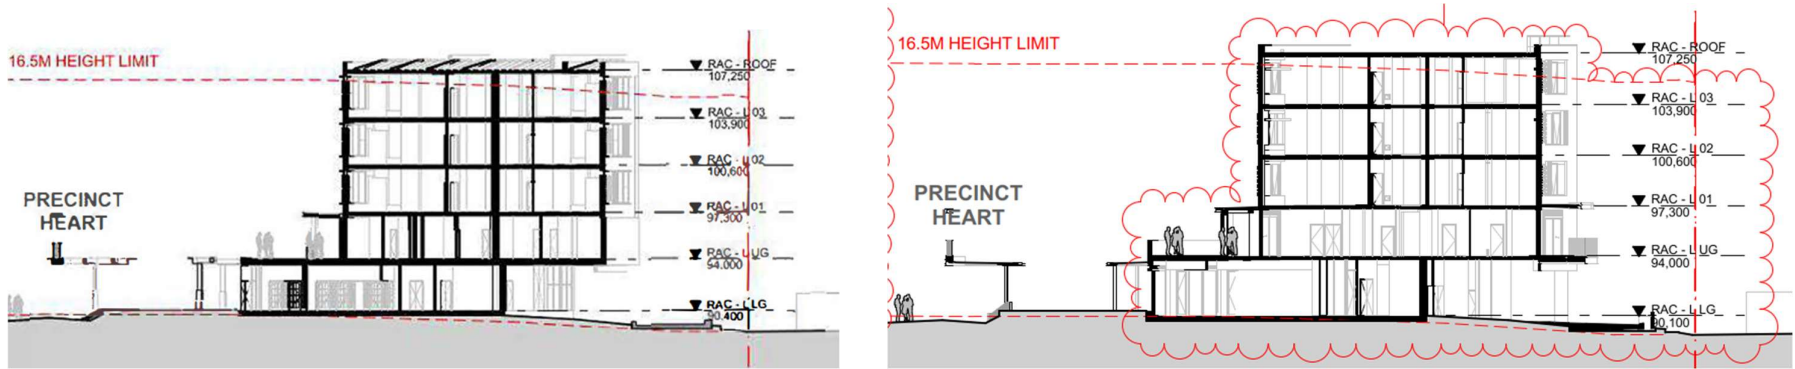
Approved and Proposed E-W Section of Building A (4 of 5)
